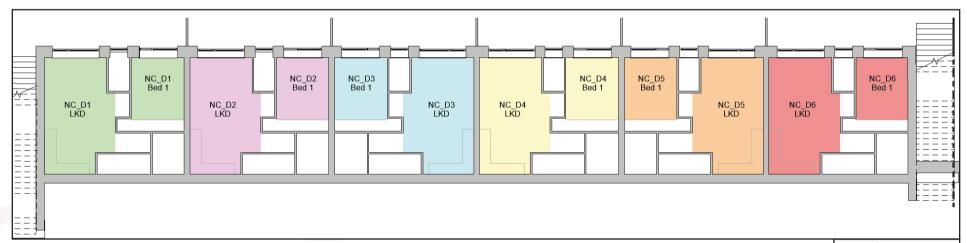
Floor plan of assessed building with keyplan highlighting the assessed building.
